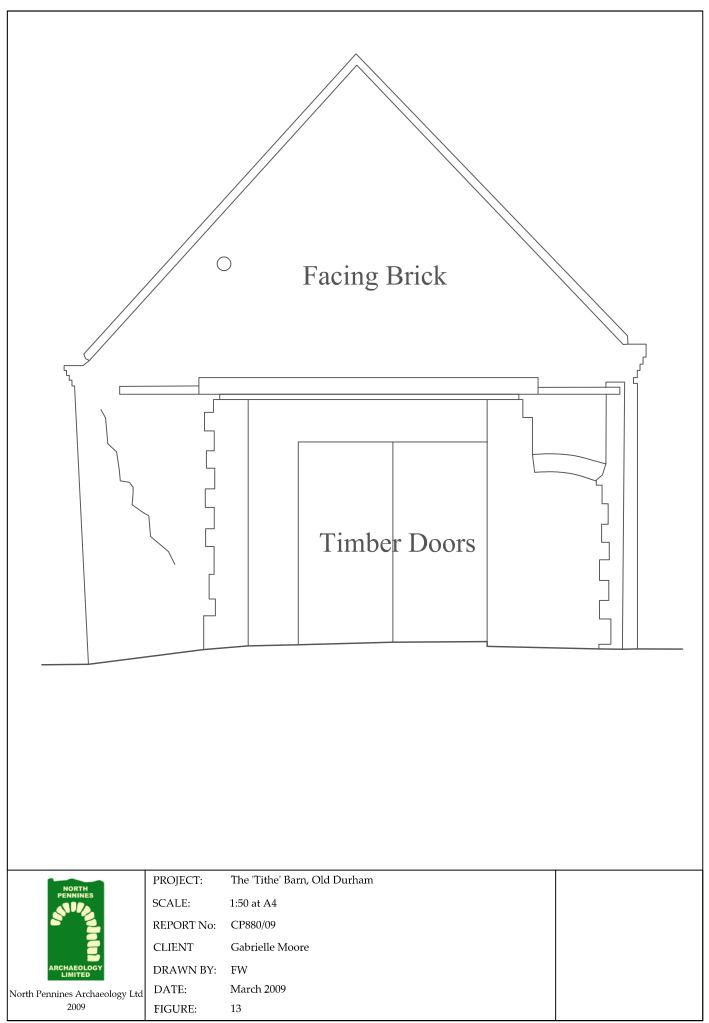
South Elevation (courtesy of Wearmouth Architectural Design)
